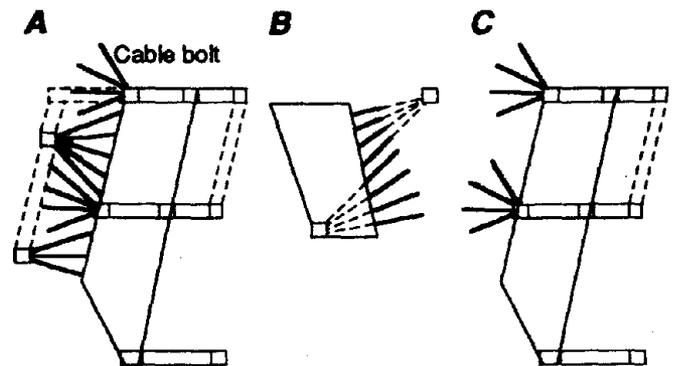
Cable support patterns for hanging walls. A, Evenly distributed, point-anchored cable bolts placed from hanging wall drift; B, evenly distributed, countersunk cable bolts; C, point-anchored cable bolts placed from a sublevel drift (Fuller, 1983).
